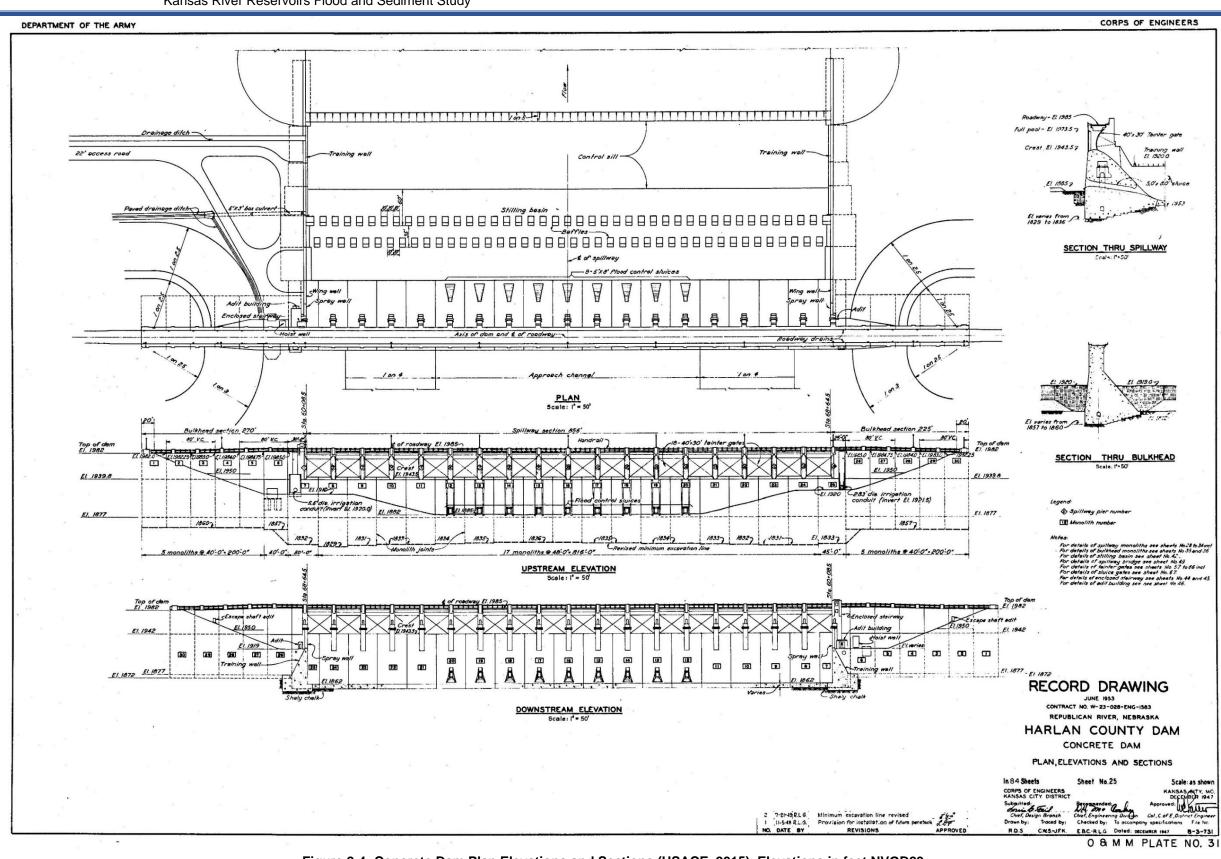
Concrete Dam Plan Elevations and Sections (USACE, 2015). Elevations in feet NVGD29.
